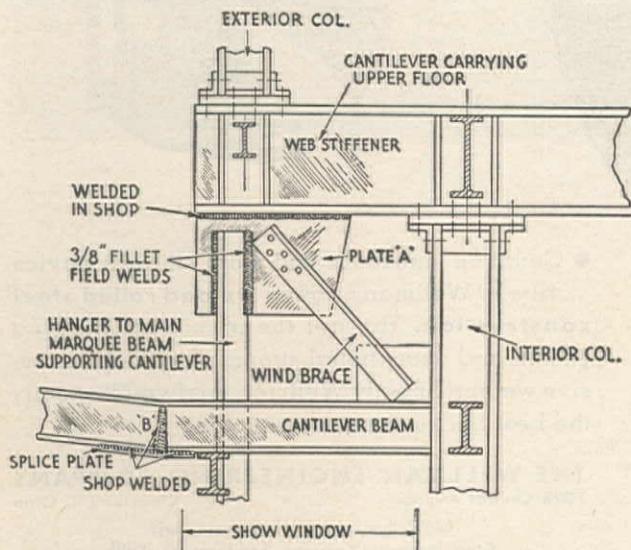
Section view of cantilever construction over show windows which supports marquee and exterior columns for upper floors.
